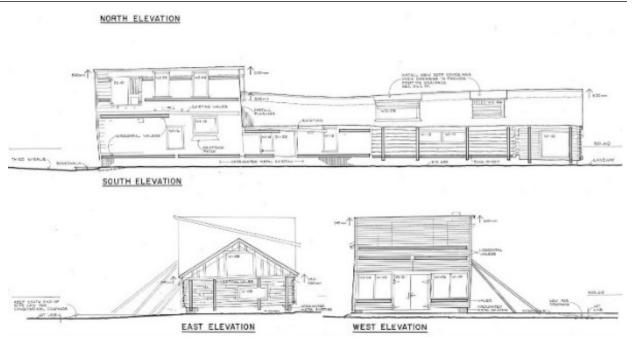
South, east, and west elevations of Biggs' Blacksmith Shop, after structural stabilization project (Parks Canada, 1983)
